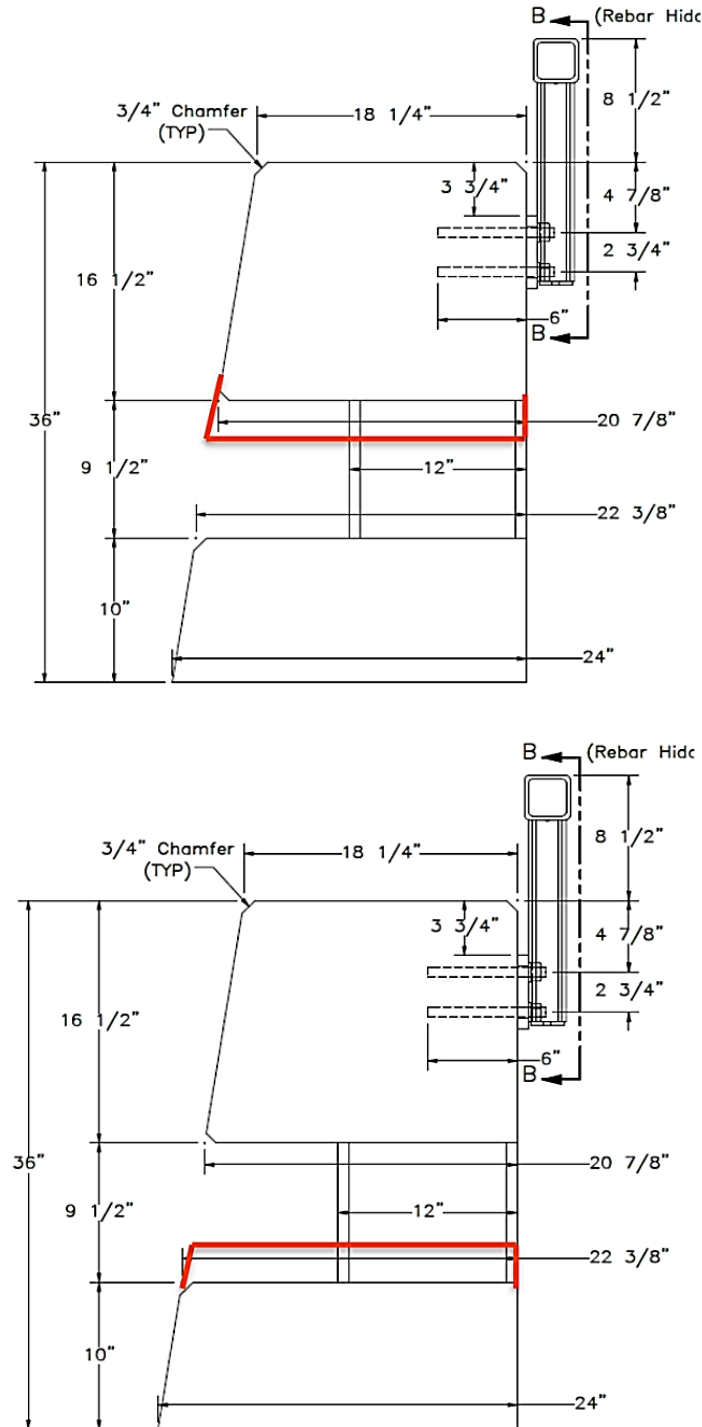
Potential Modification for Reducing the Opening Height between Curb and Rail
